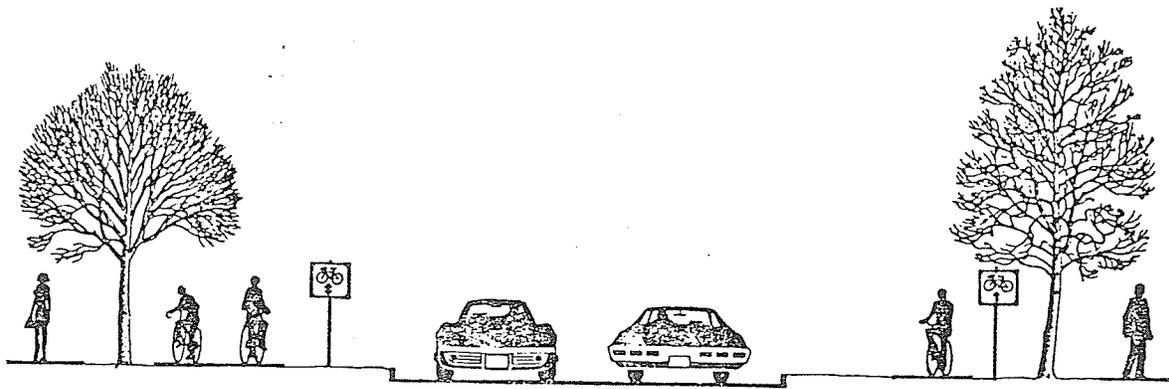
CLASS II SIDEWALK BIKEWAY
